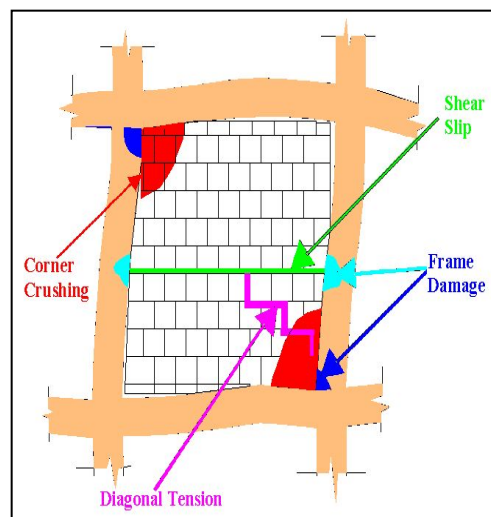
Typical failure modes of URM infill wall and frame.(Photo from Klingner 1976)
